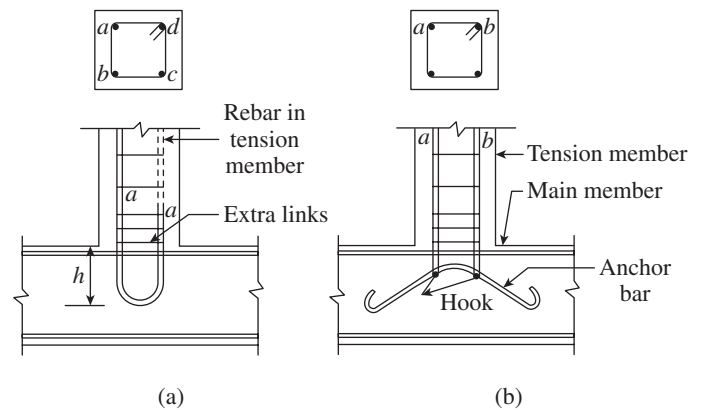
Anchorage for tension member reinforcement (a) Anchorage of rebars (b) Hooked anchorage
